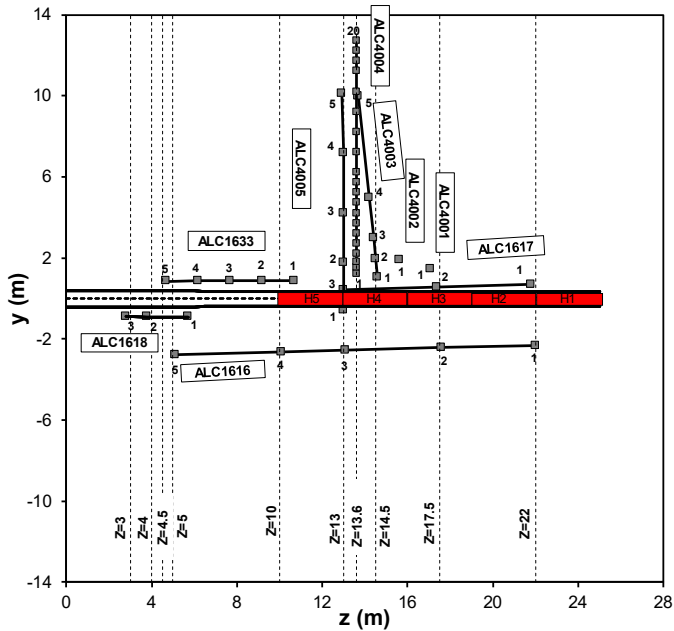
Horizontal cross-section of the instrumentation and alveolus arrangement.
